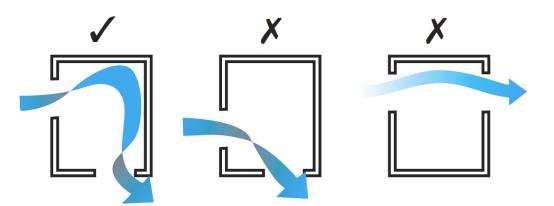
Floor plans showing effective and un-effective window relationships for cross-ventilation.
